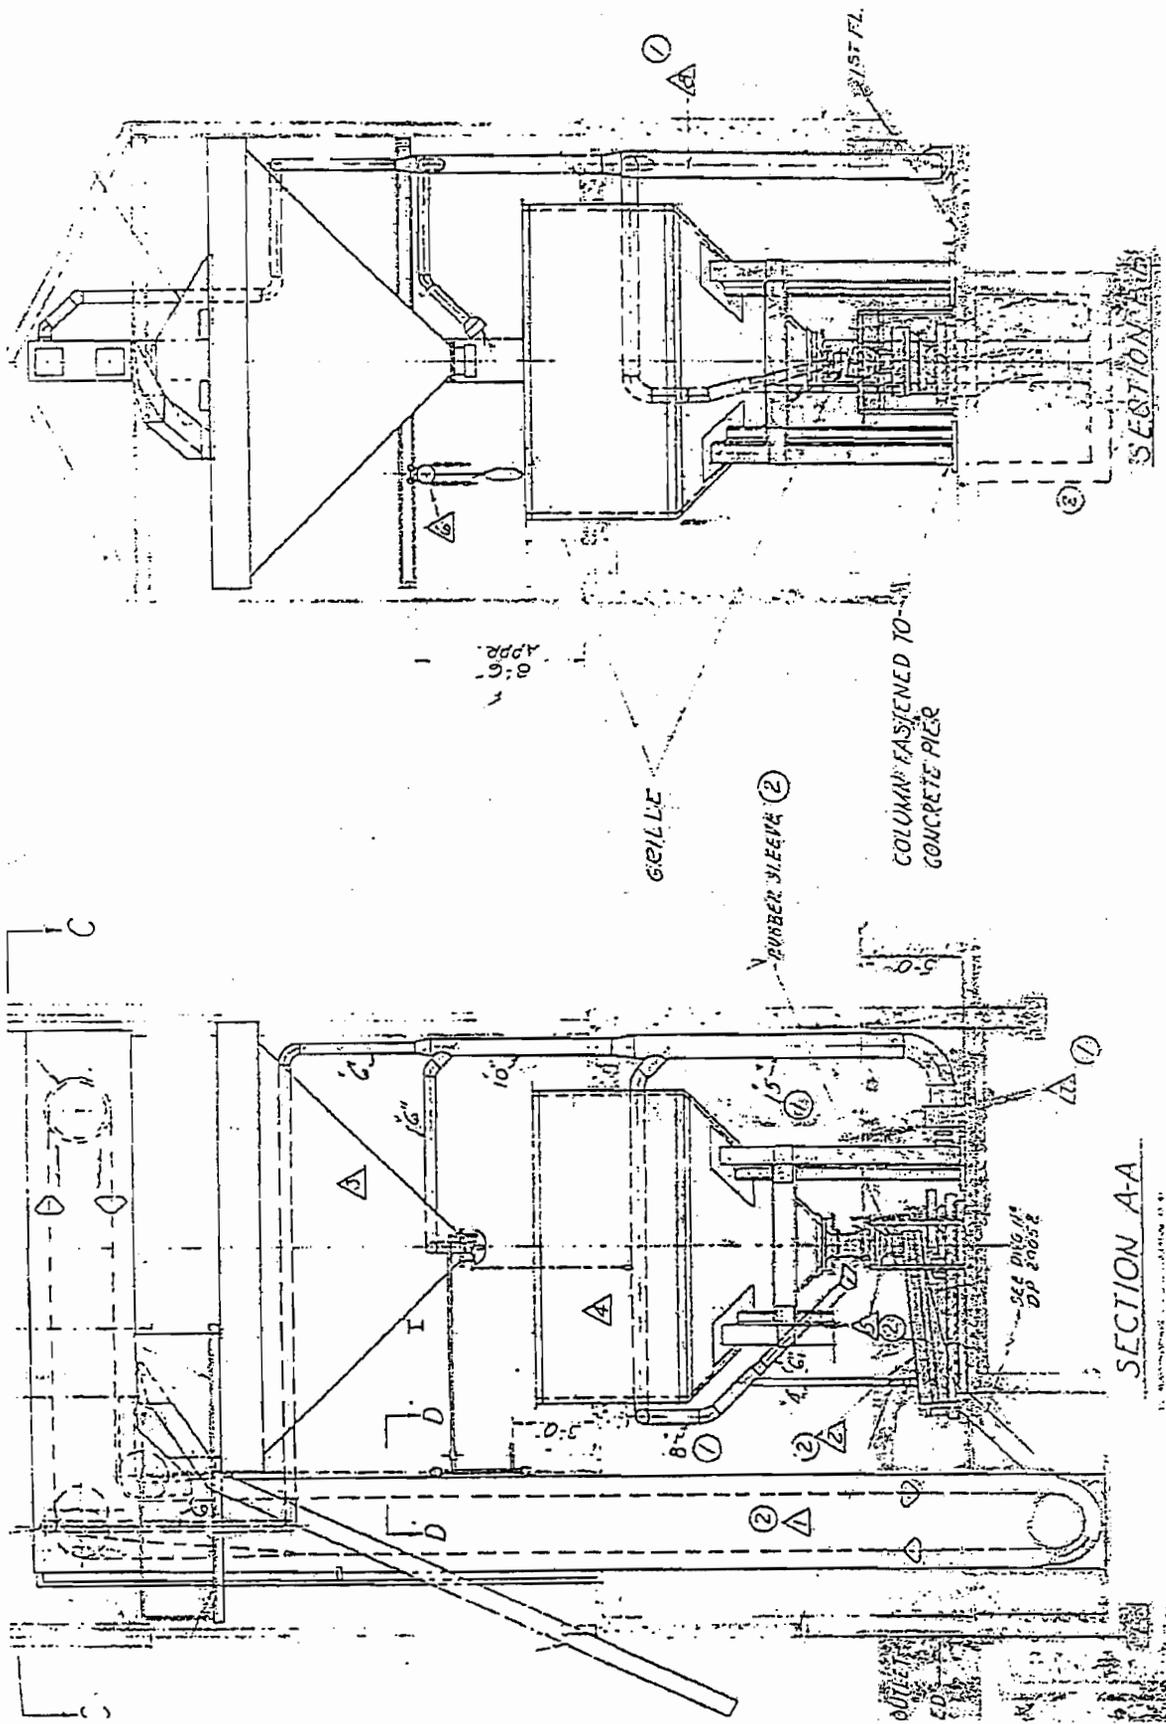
Building 607, Blueprint # DP-28167, detail from *Building 607, Shell Fragmentation Bldg., Plans, Elevations and Sections*, May 15, 1940, War Plans Division, Ordnance Department, Picatinny Arsenal, Morris County, New Jersey (on file in DPW, Picatinny Arsenal).
